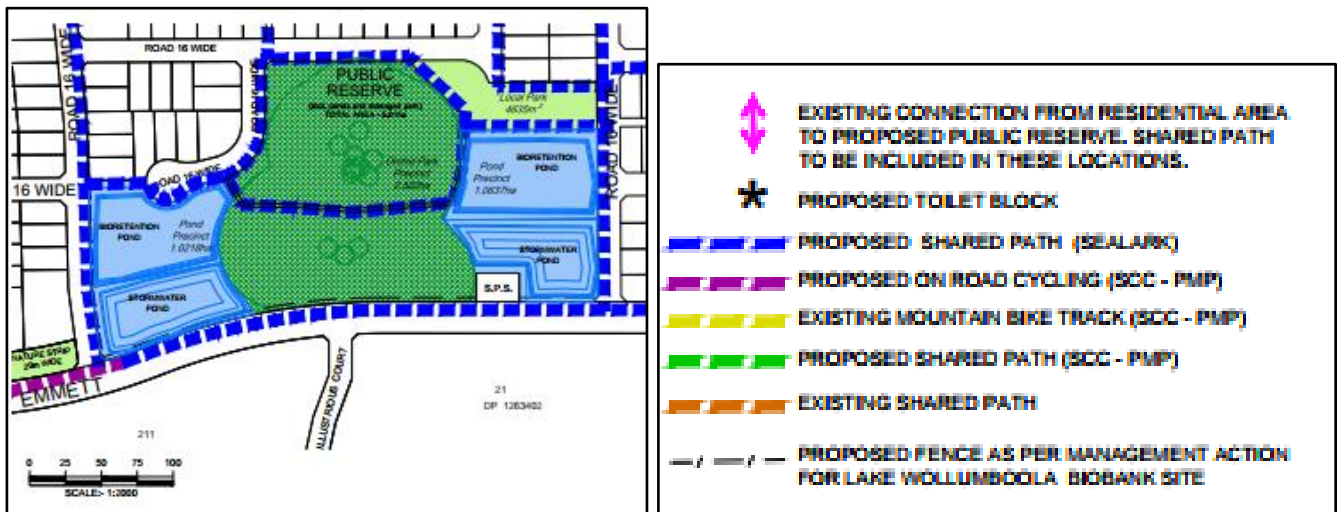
Callala Bay Expansion Area – Showing central public system (Shown in more detail in Appendix A and separate plans are provided as part of the accompanying plans to the proposal)
